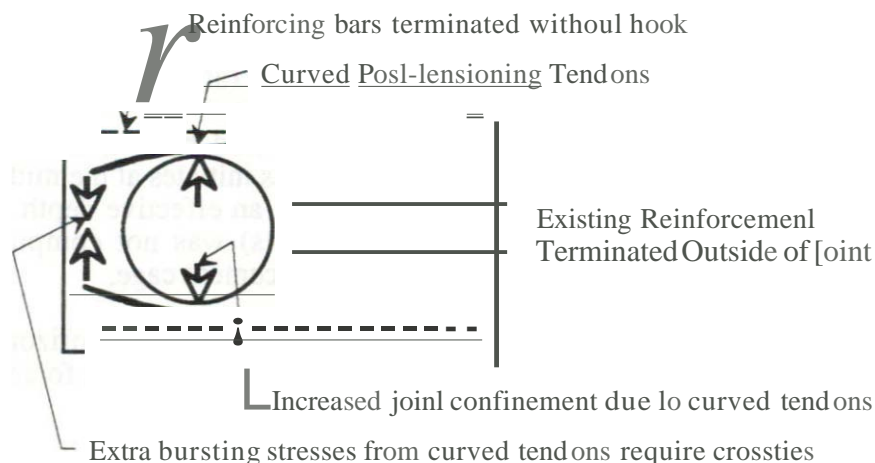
Schematic Top View of Bent Cap Joint Connection Showing Termination of Reinforcement and Post-tensioning, and Bursting Reinforcement
